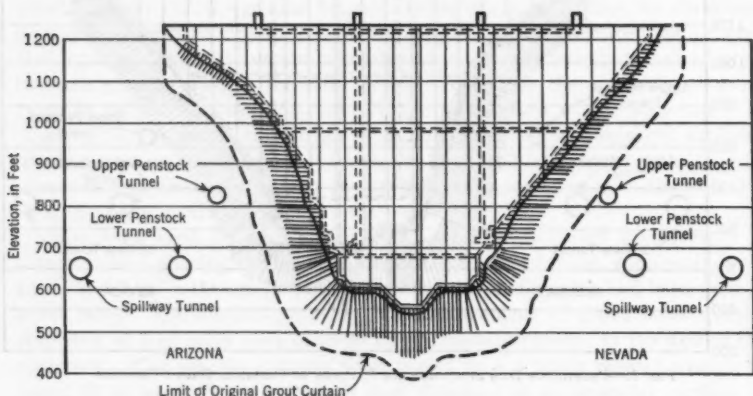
PROFILE OF DAM SITE SHOWING PATTERN OF ORIGINAL DRAINAGE SYSTEM
